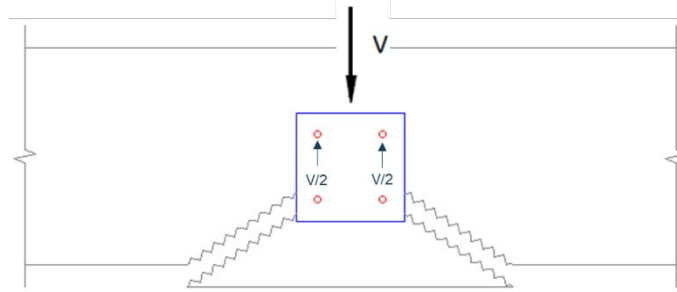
Concrete breakout failure of embedded plate with welded headed studs loaded in shear towards an edge.
